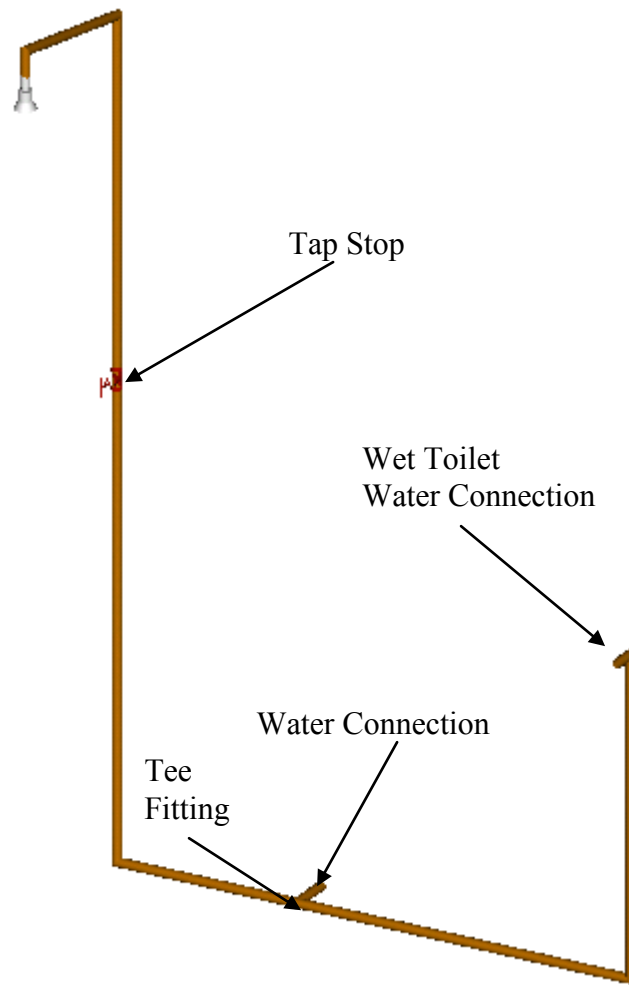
Wet toilet washing facility design with structure hidden to reveal cast piping
